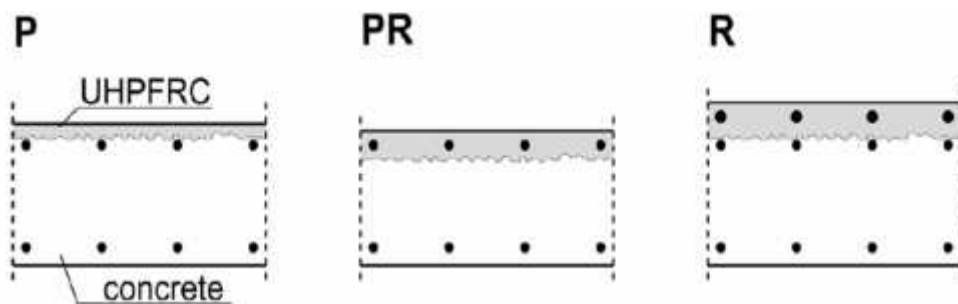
Basic configuration for composite structural elements combining UHPFRC and conventional structural concrete
